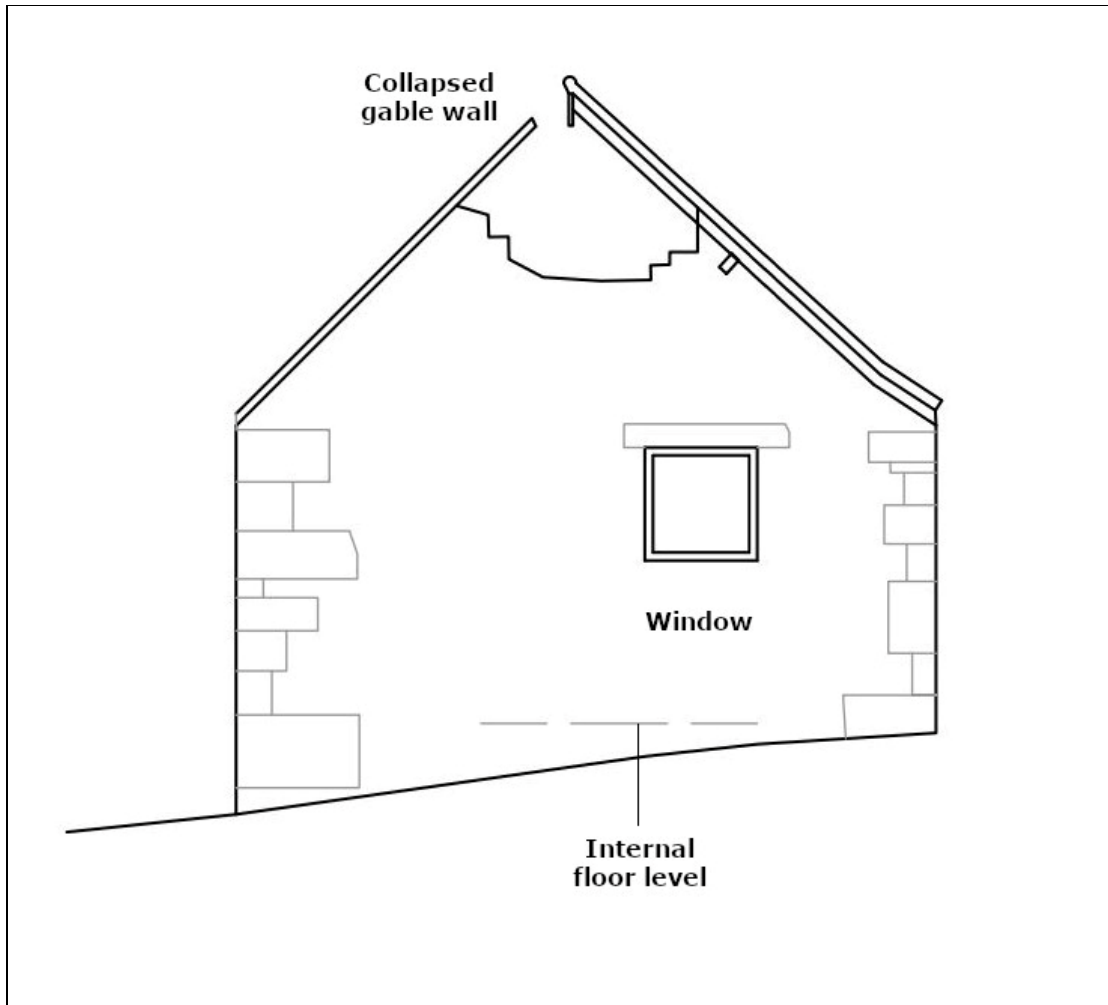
The eastern gable elevation showing the collapsed apex and the position of the window. Note the dashed line showing the level of the internal floor, which is higher than the surrounding ground due to the position of the building on a moderate slope. (Source: Herson Associates, 2017. Originally drawn at 1:50 but not to scale here, and with annotations by Trysor, 2020).
